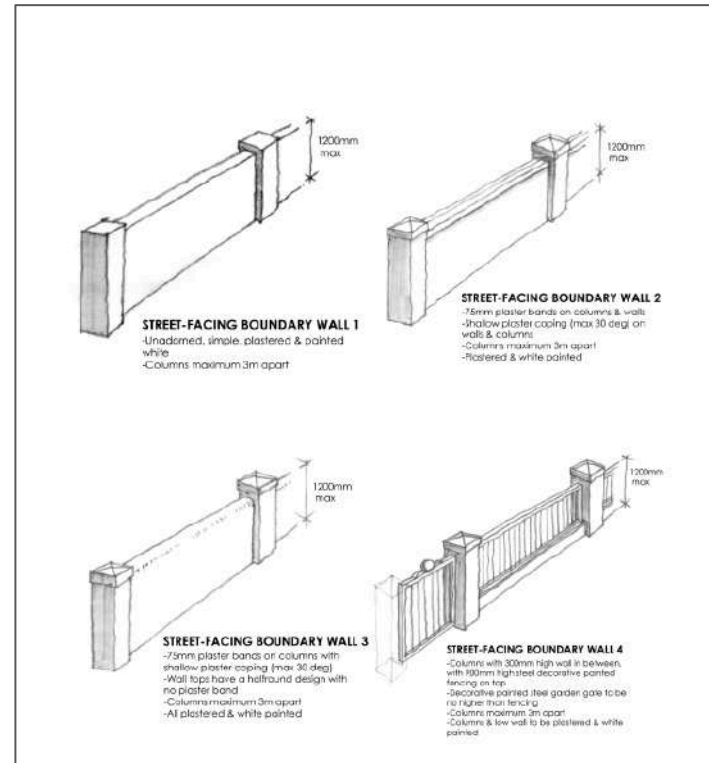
Types and sizes of typical street facing boundary walls, Architectural guidelines Rev 14 2026
